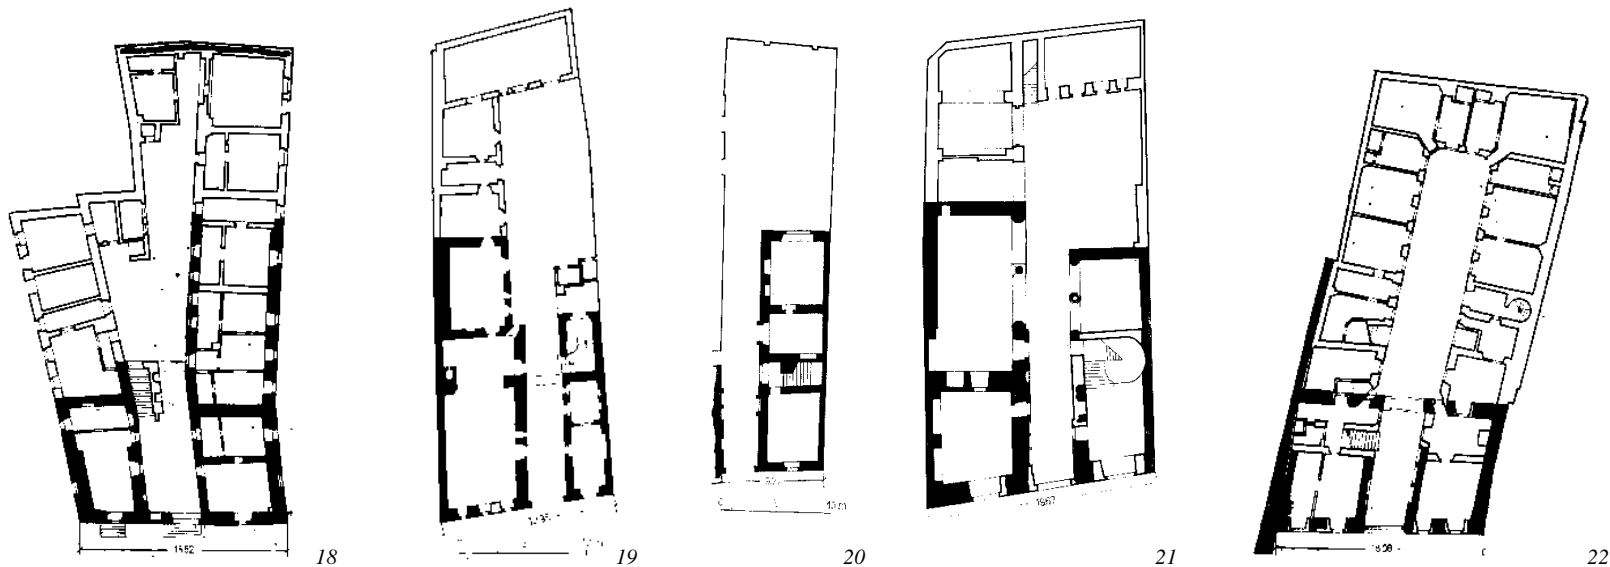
Ground plan of the mediaeval walls of the house No. 47 Uri Street, Budapest, Hungary.
